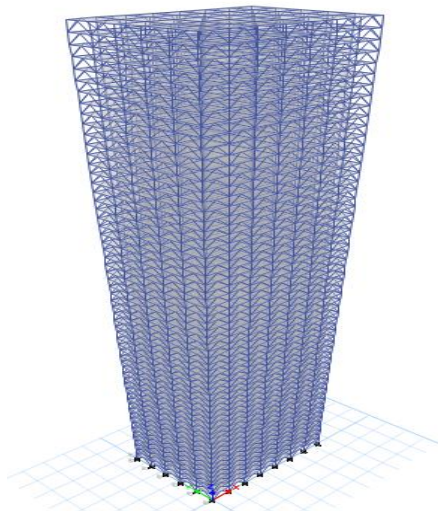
Elevational View of Rectangular Shaped Chevron Bracing
